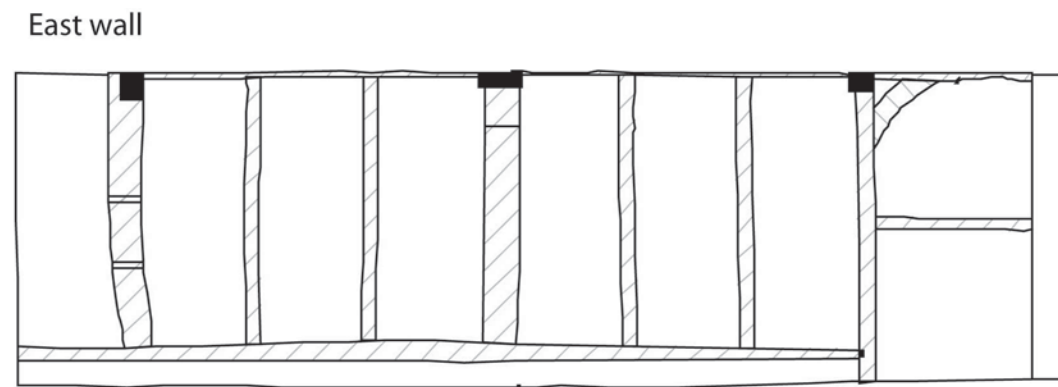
G1A: timber framing to east & west walls (Scale 1:100)
